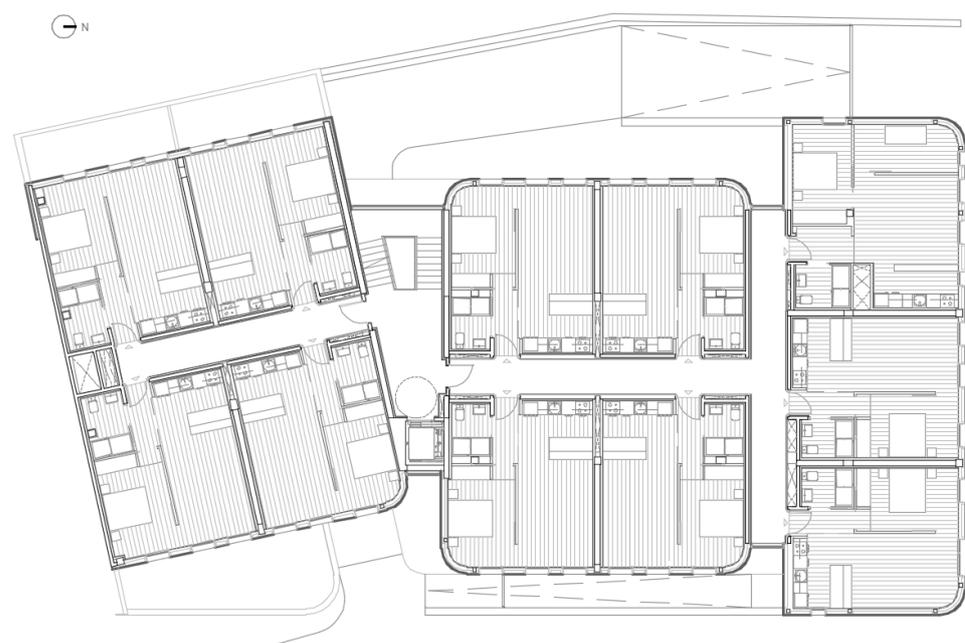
General floor plan of the project for 43 housing units in Irún-Larzabal, by the architect Asier Acuriola.
